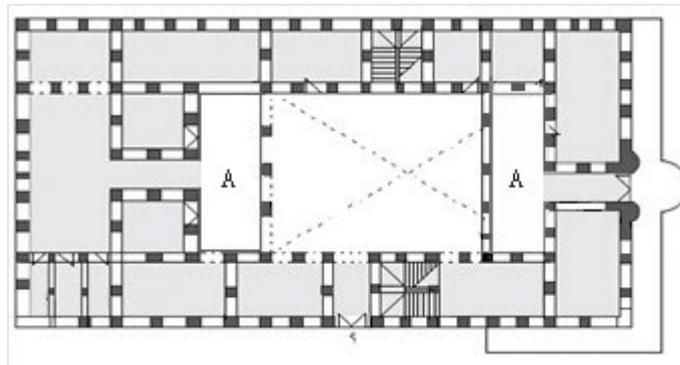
A ground floor plan of a house in Al-Khobar shows the terrace (*loggia*) around the courtyard.
